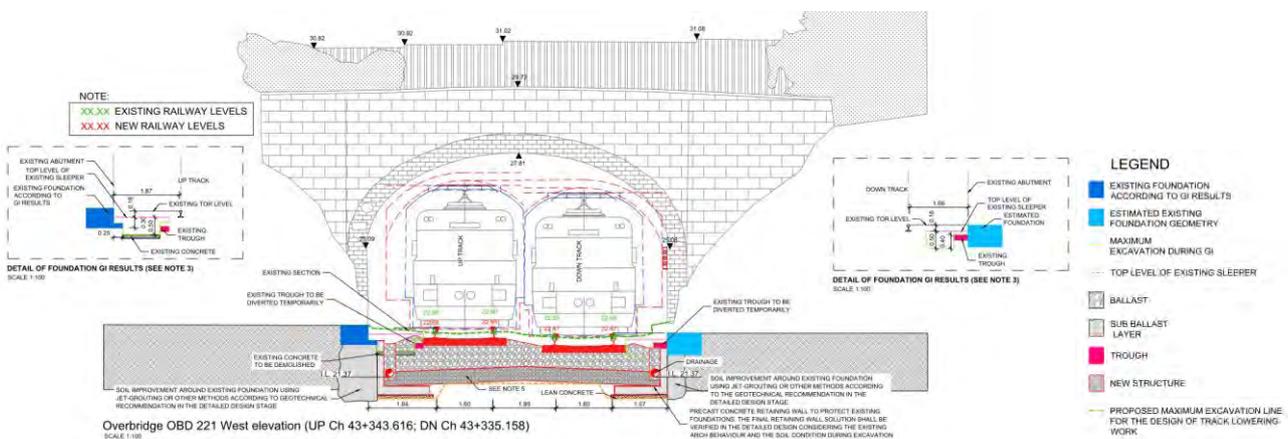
Section showing proposed L-form retaining wall at OBD221
